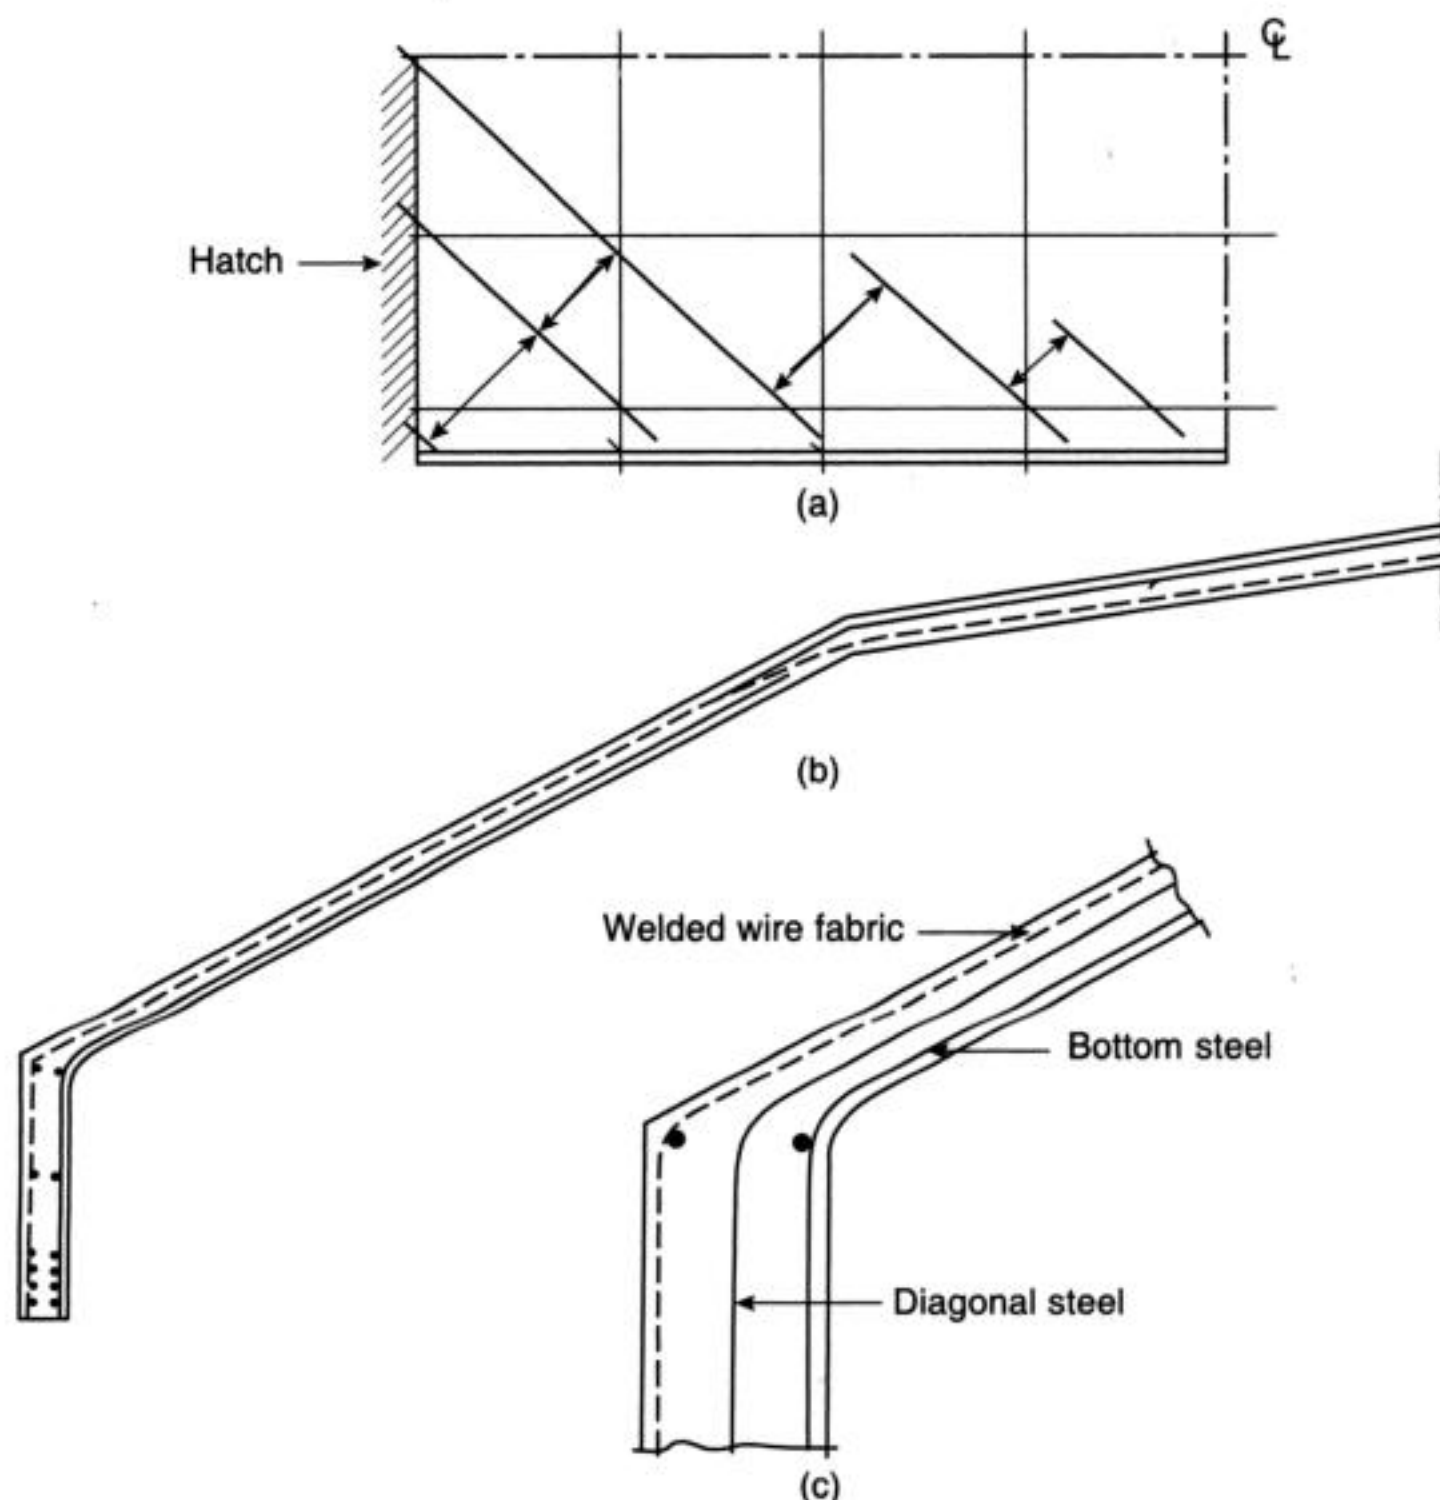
Detailing of steel in folded plates for a single barrel cylindrical shell: (a) Placement of shear steel elevation (b) General arrangement of steel at midspan (c) Details at joint 1.
